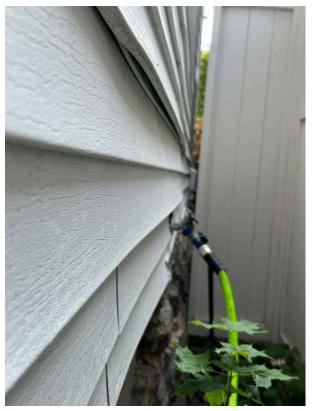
SEPARATED VINYL SIDING ALLOWING WATER INFILTRATION LEFT ELEVATION
